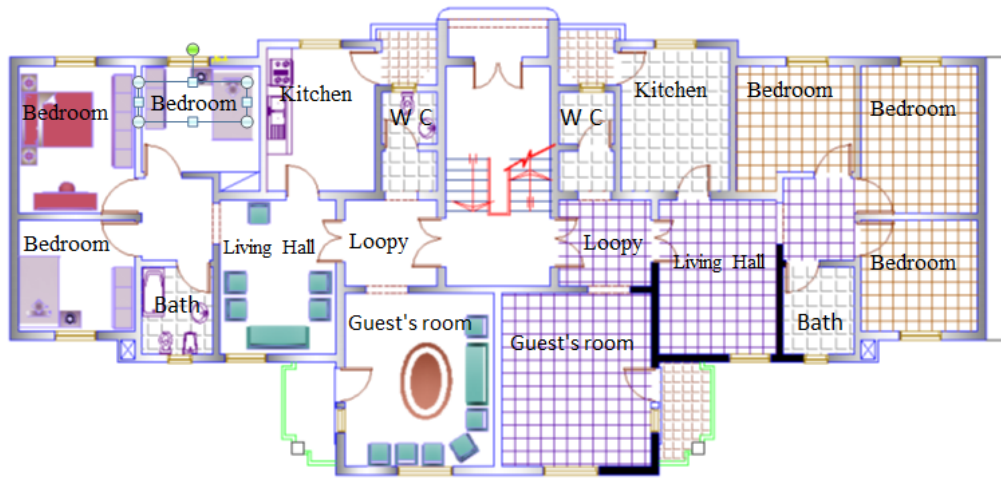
Ground Floor Plan for Buildings No (5, 6, 7,8,9,10,13 and 14
